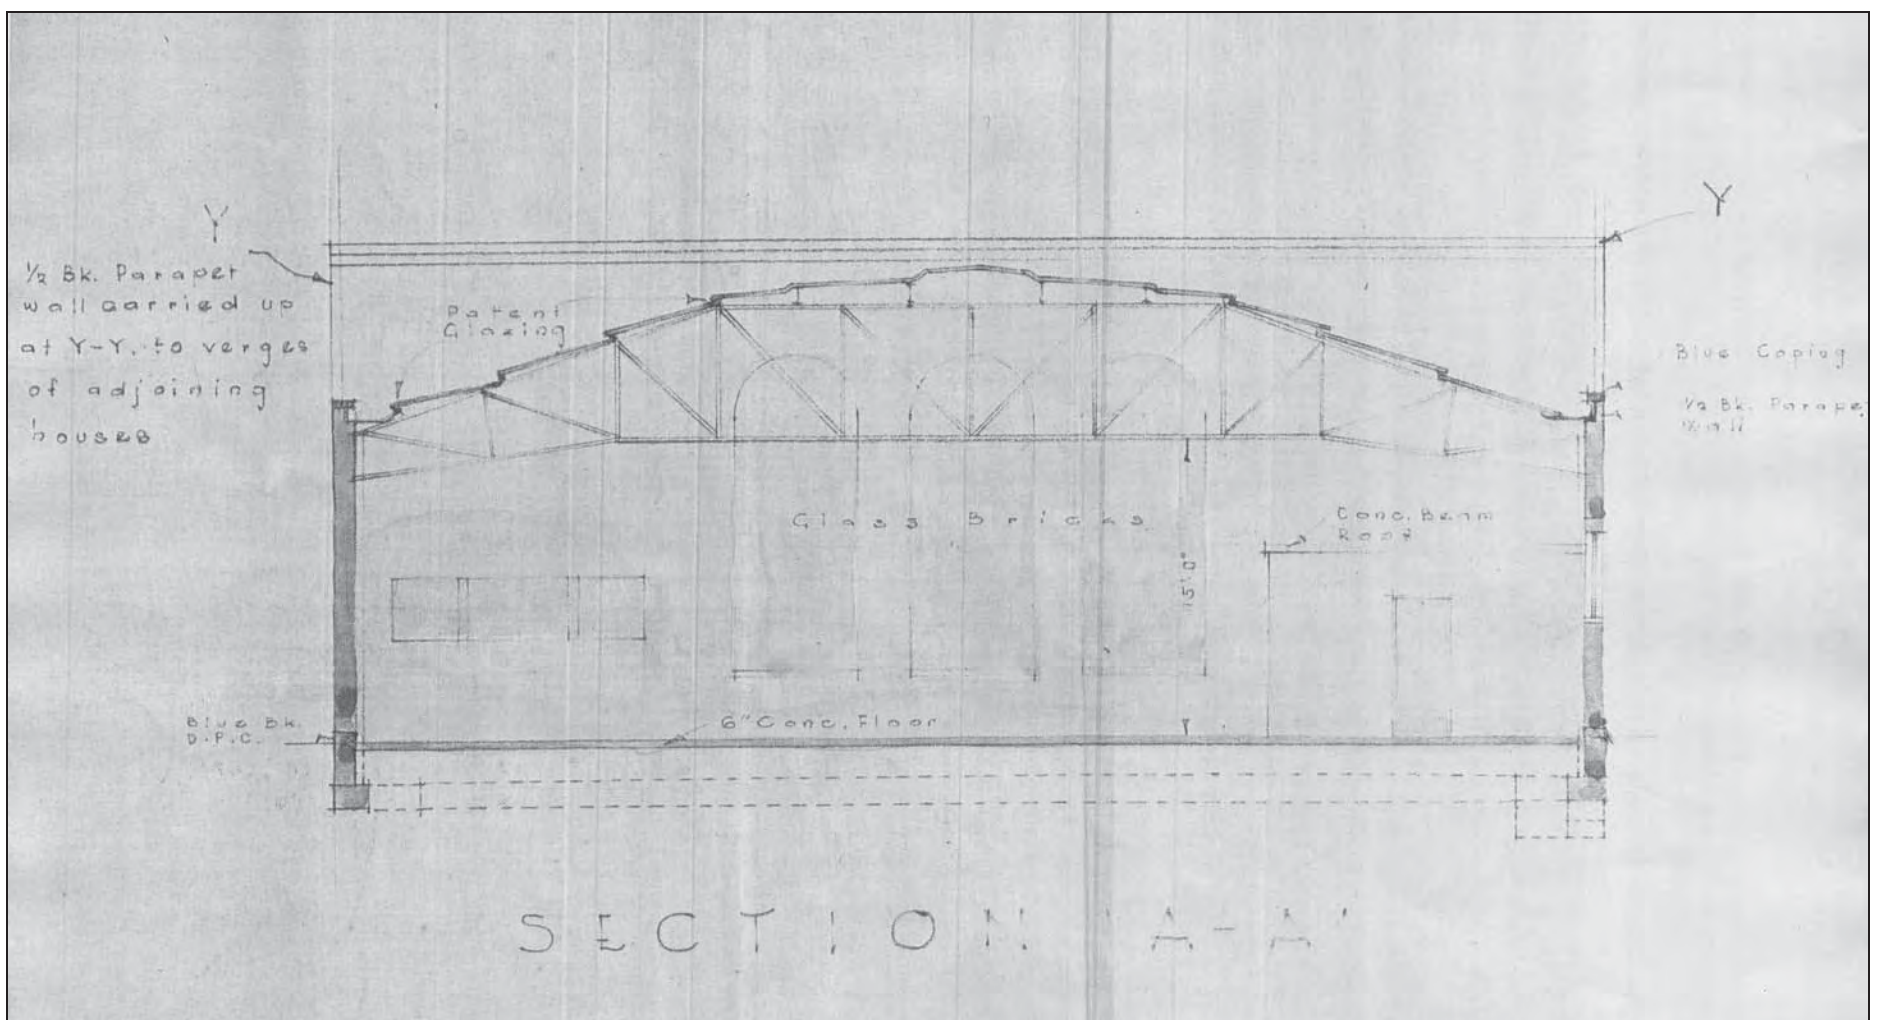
Cross Section A-A, showing roof structure of Sibson's Garage (Stockdale Harrison & Sons, 1951; taken from LBR Plan 76644)
